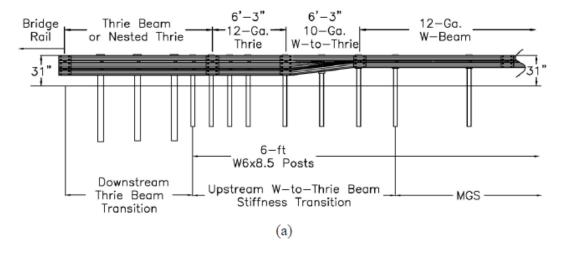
Test Impact Drawings for Test No. MWTC-3.
